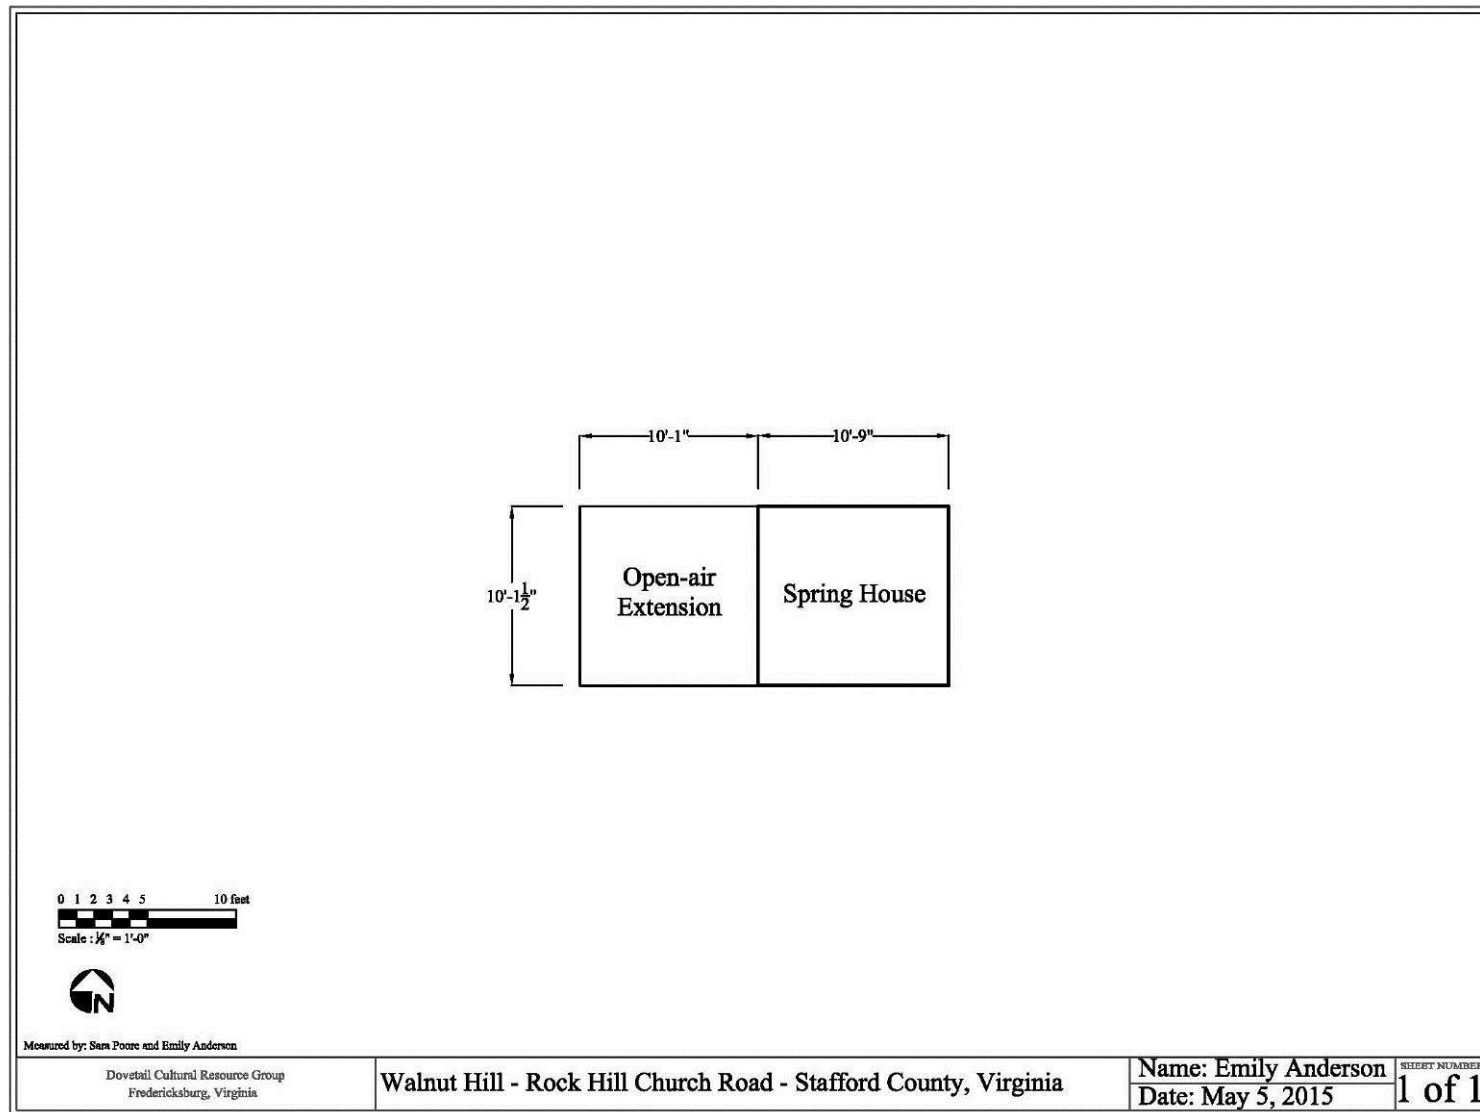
Measured Exterior Plan of the Spring House at Walnut Hill.
